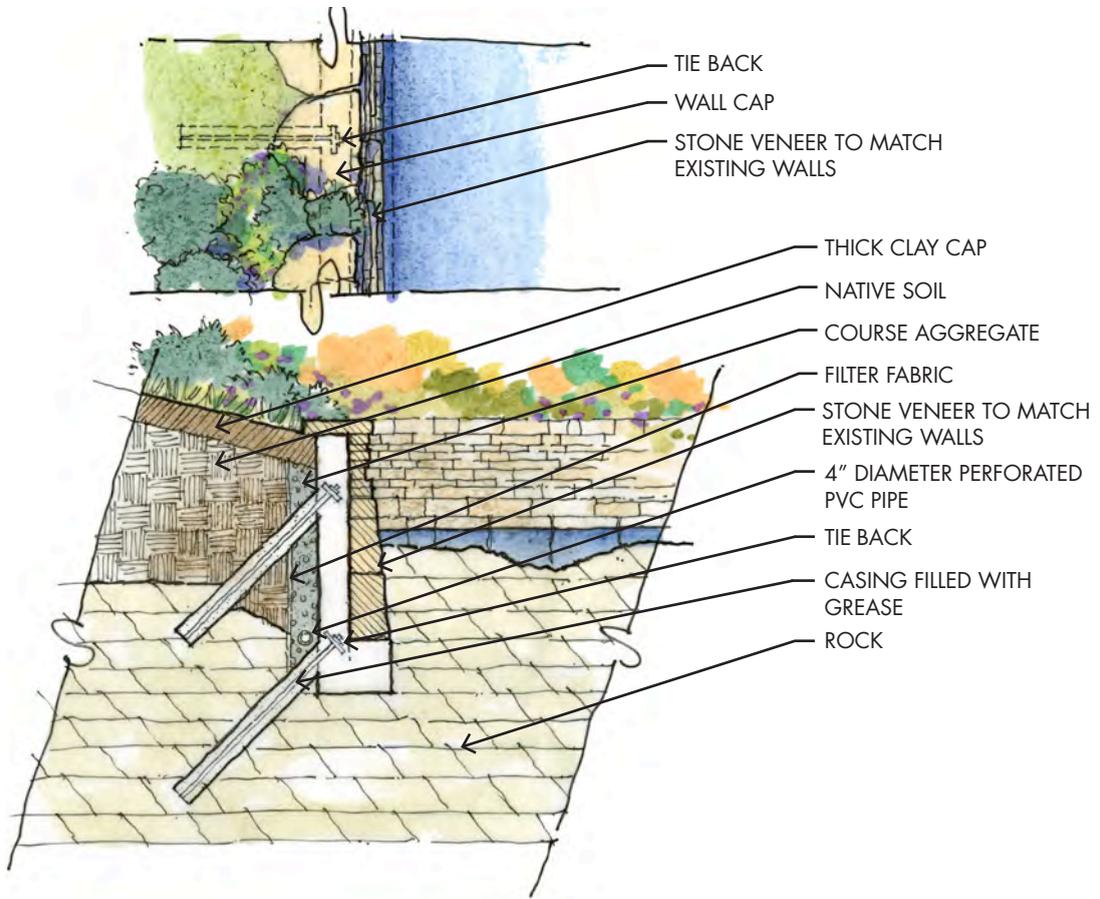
Wall Type B. Concrete Wall with Tie-Backs
